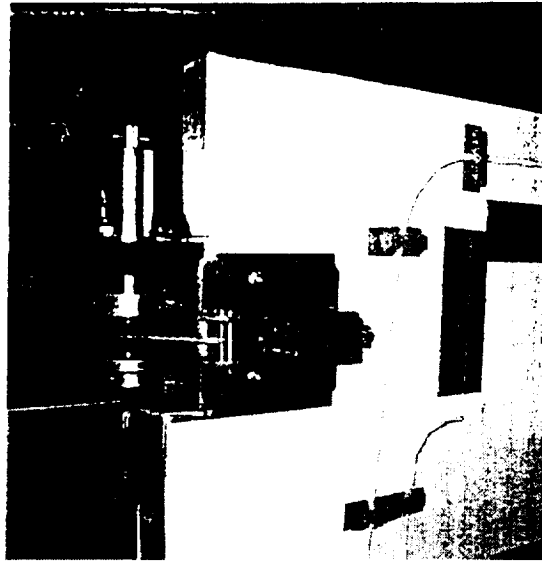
Spring Tensioned Cable around Upper Panel-to-Panel Locking Hinge
